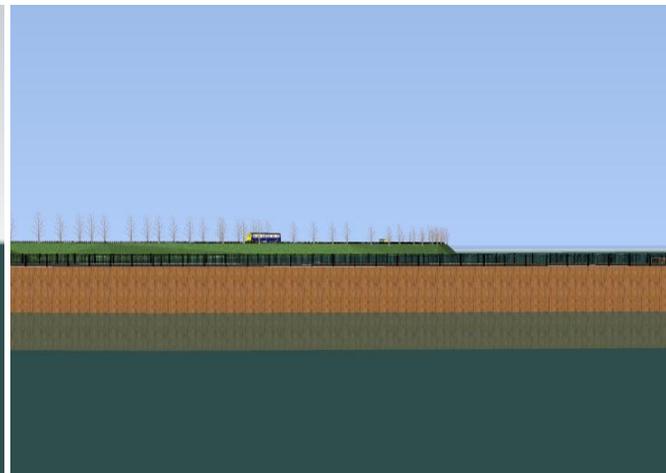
Walkway, Option 2, with existing jetty, northerly view
